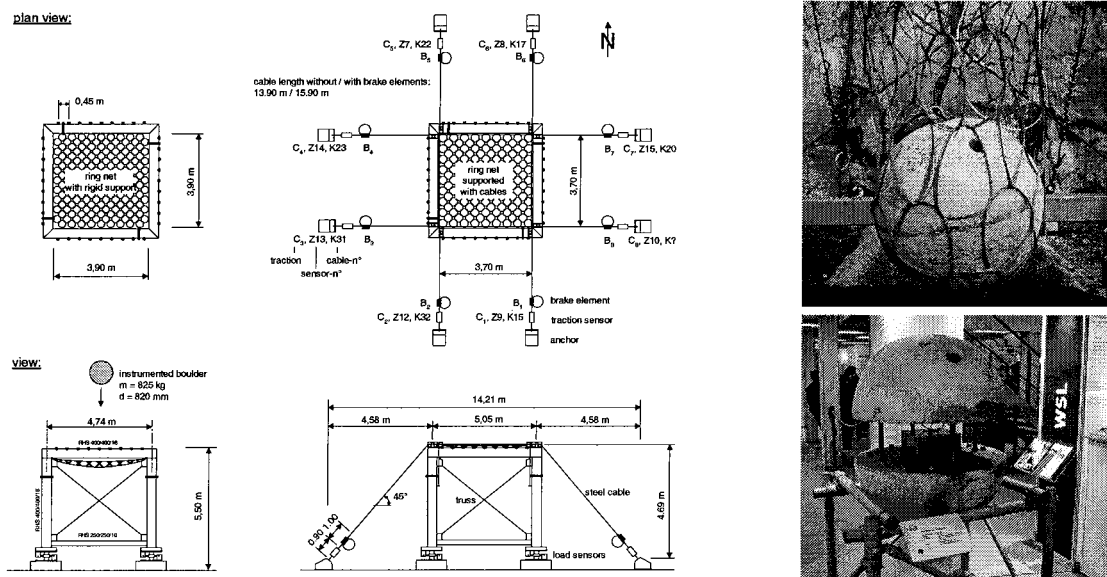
Plan and elevation of the field apparatus for experiments with single spanned nets (left); instrumented concrete sphere with a diameter of 820 mm and a mass of 825 kg (right).
